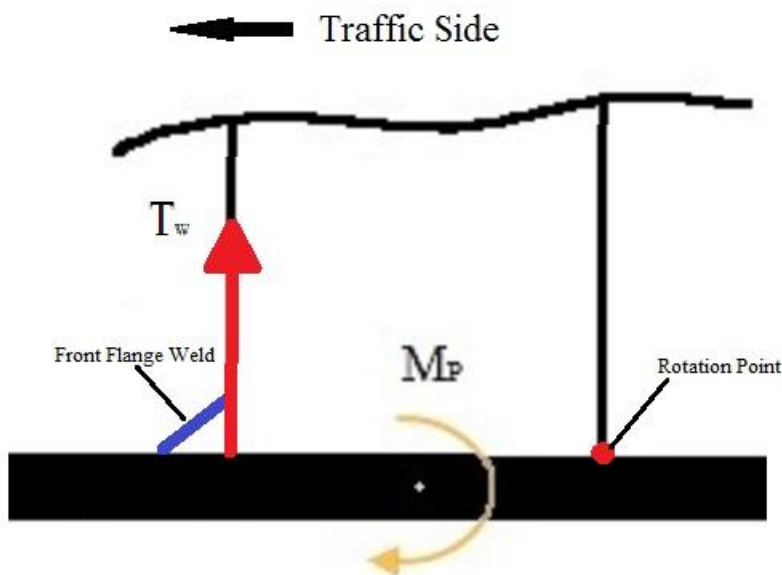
Post-Baseplate Front-Flange Weld Tension Diagram
